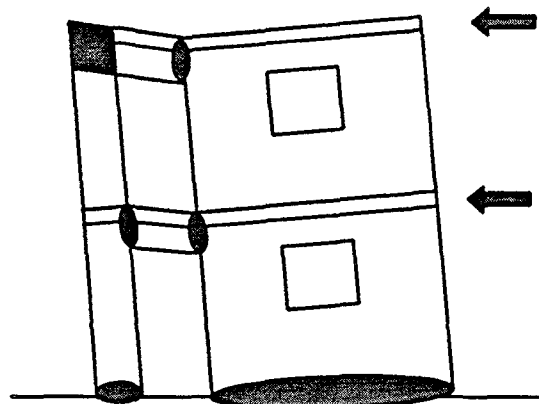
Observed collapse mechanism for Specimen 1b; Northward loading.
